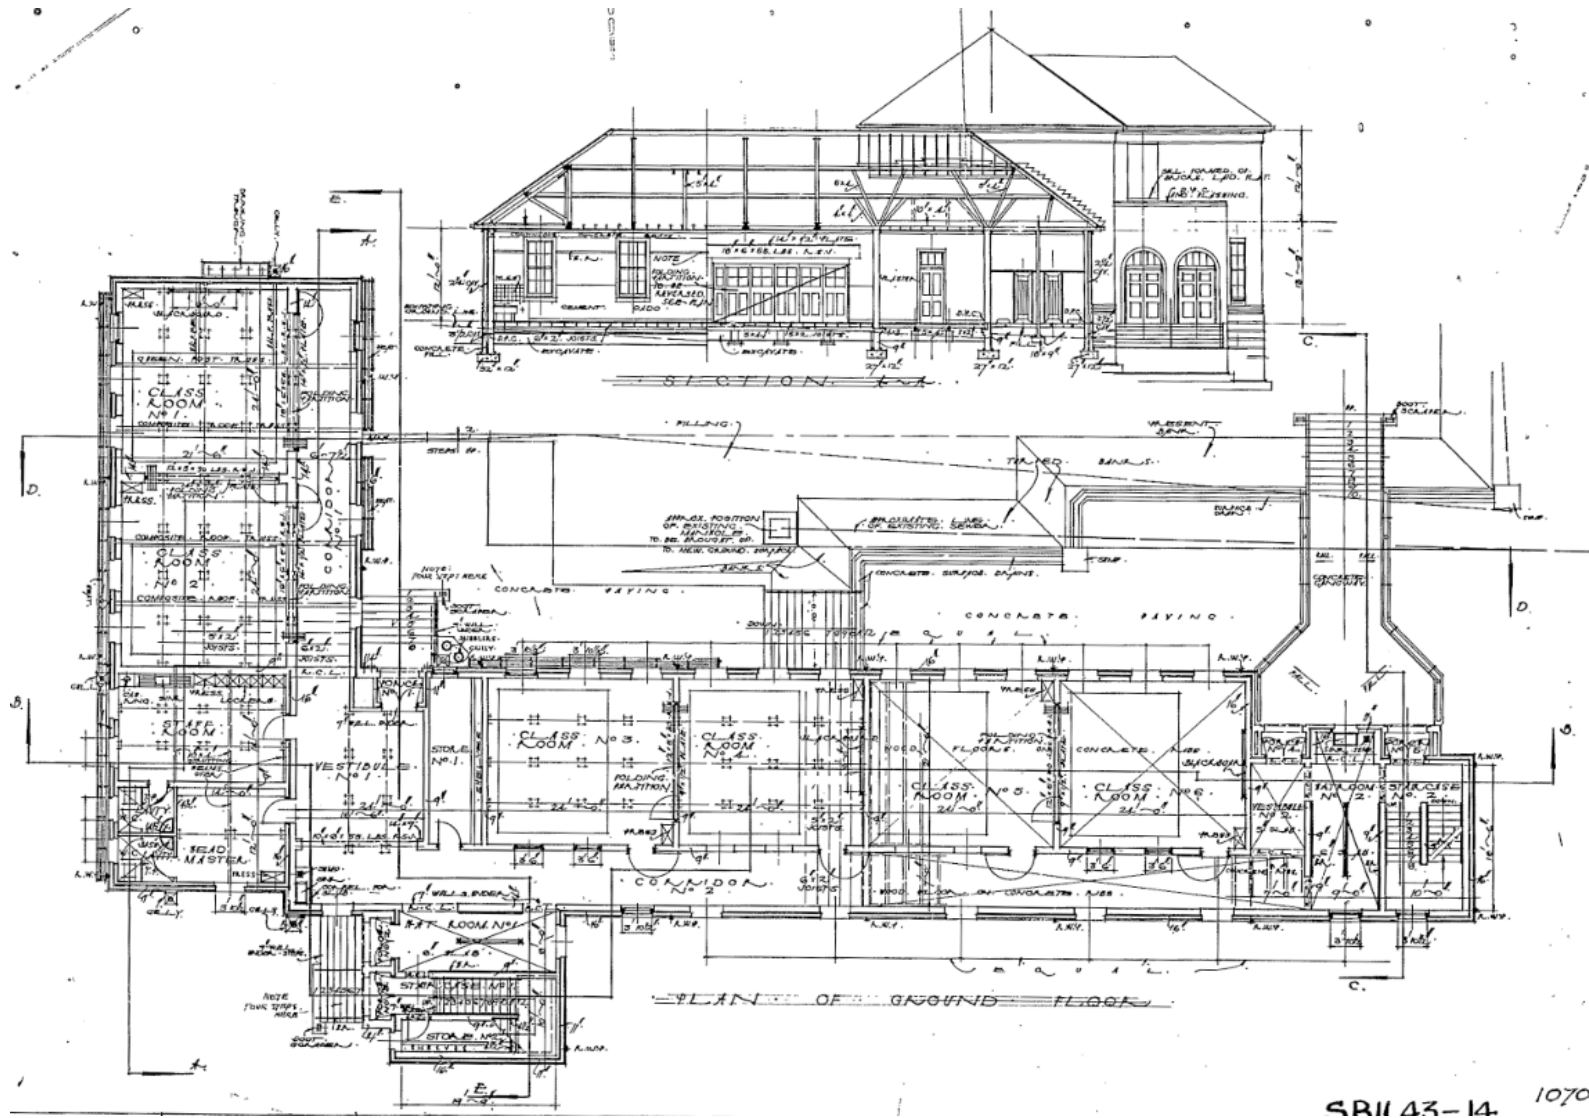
1934 Section and Ground Floor Plan of the Boys building, currently known as River building.
